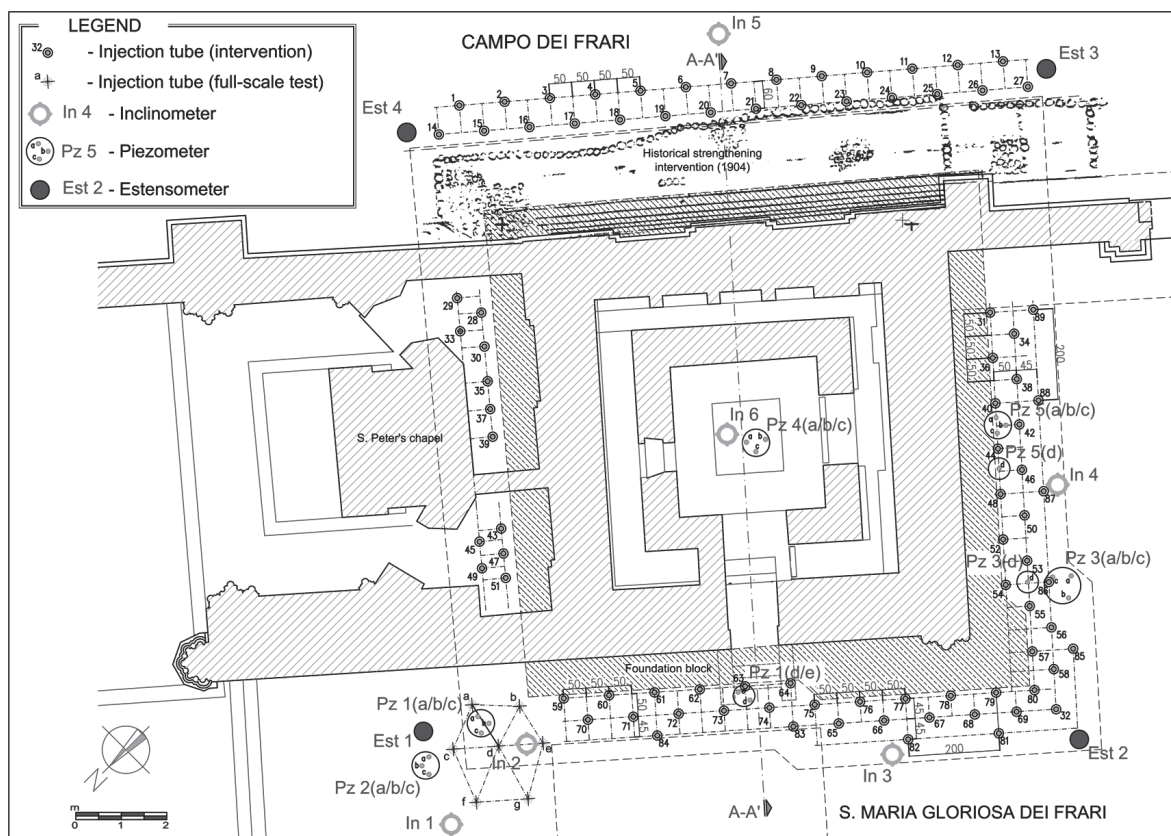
Plan of the Frari bell tower with TAMs lay-out and location of geotechnical monitoring devices (Lionello, 2008).
